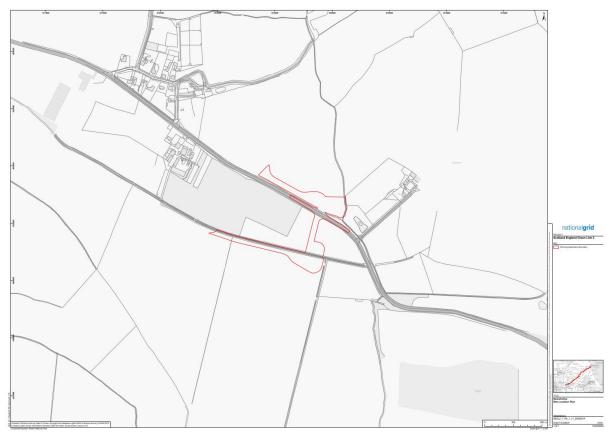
Site location plan (SEGL2\_T\_PA\_1\_v1\_20240214).
